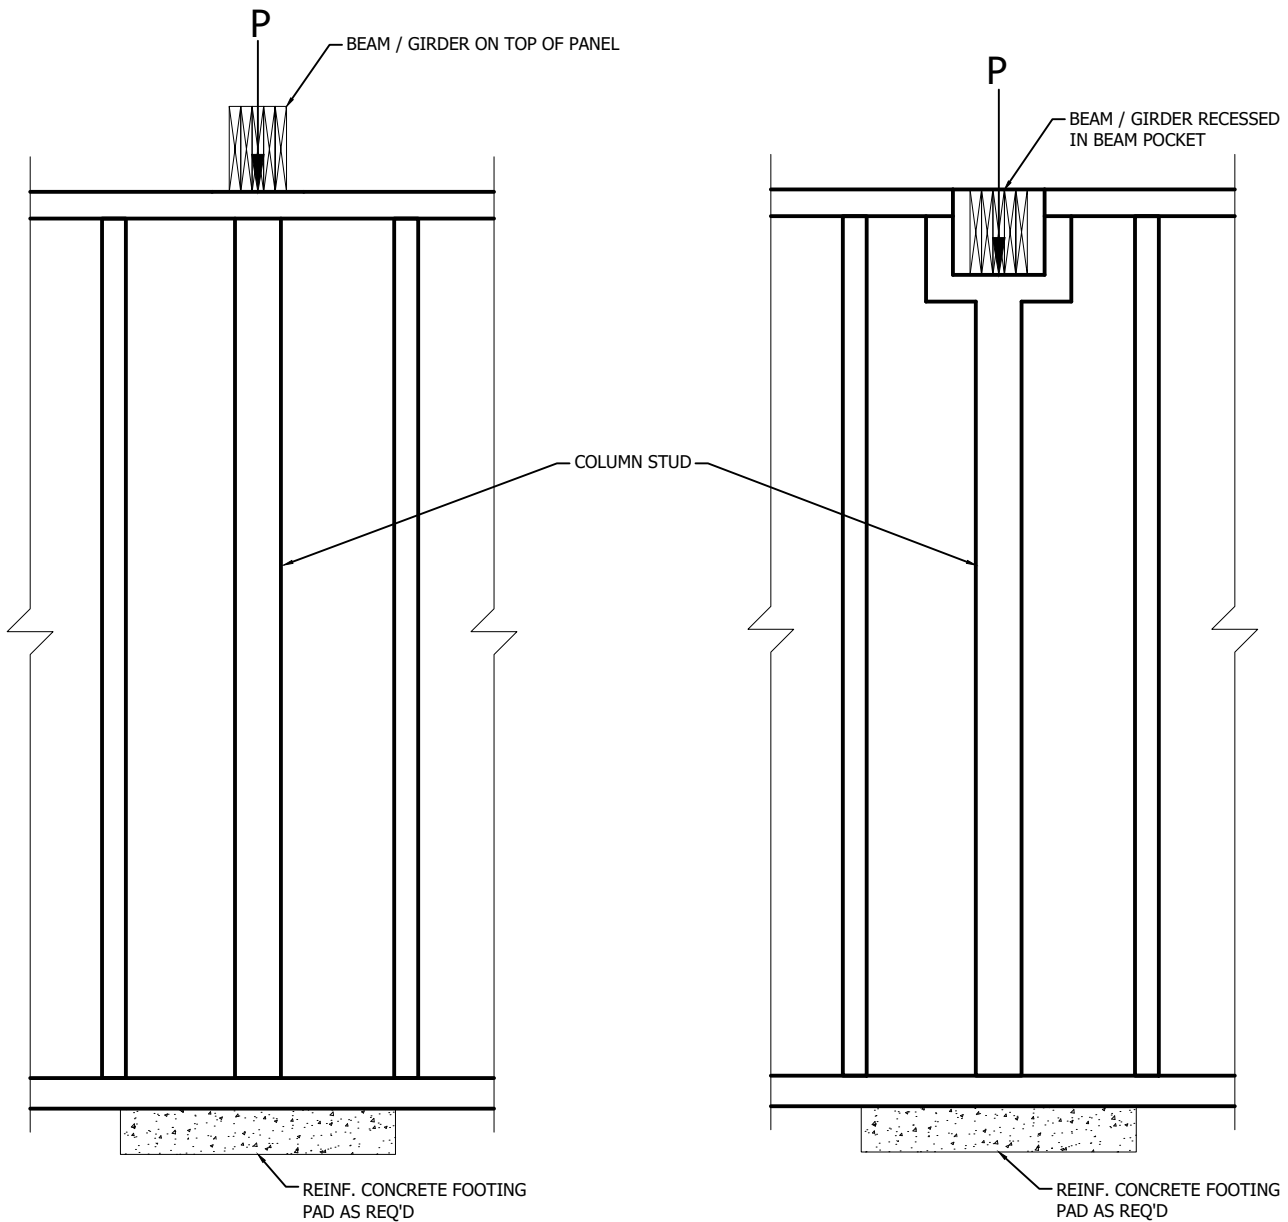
BEAM POCKET / STUD COLUMN DETAILS
